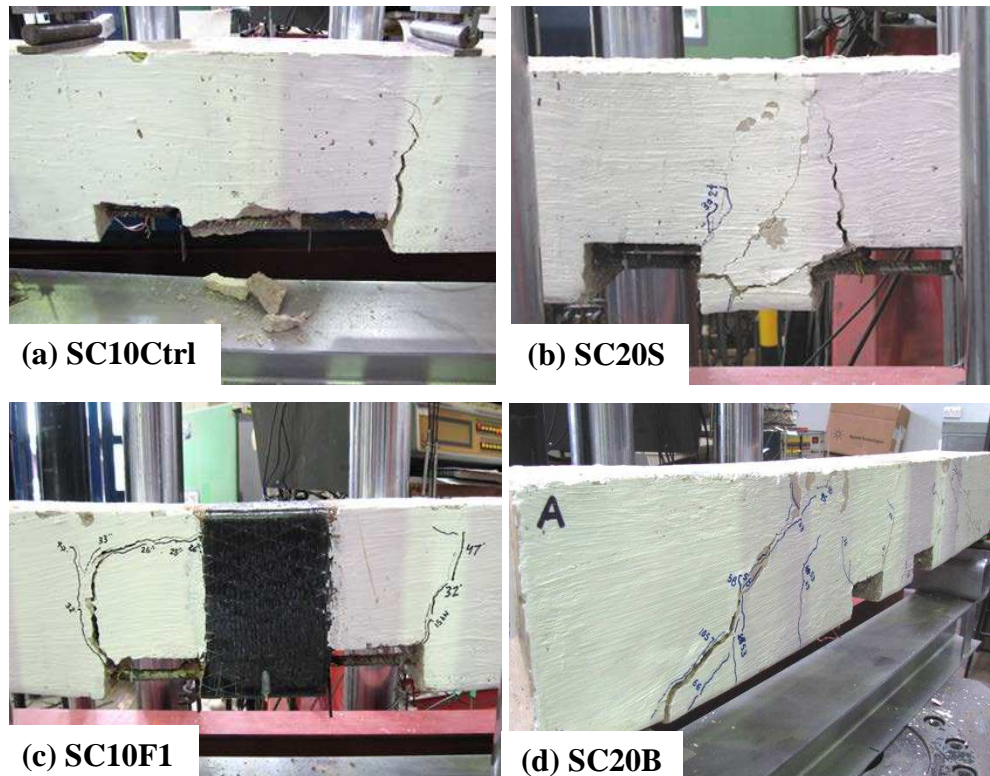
Typical failures at the midspan of beams: (a) unconfined control, (b) steel-confined, (c) CFRP-confined, and (d) benchmark
